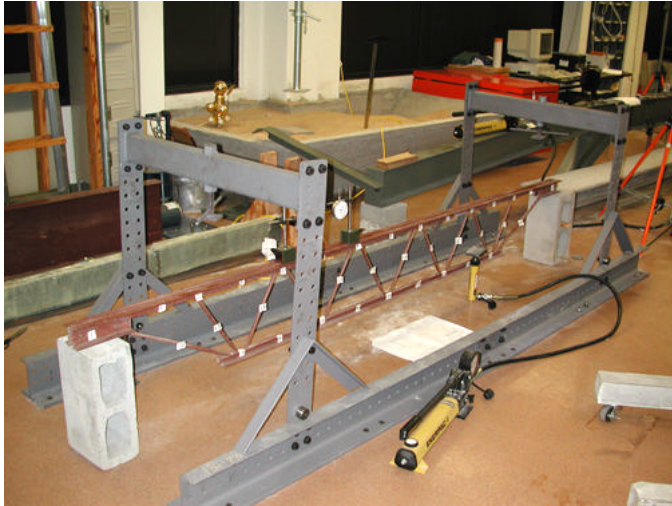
New rig for testing of steel elements with truss in preparation for testing.
